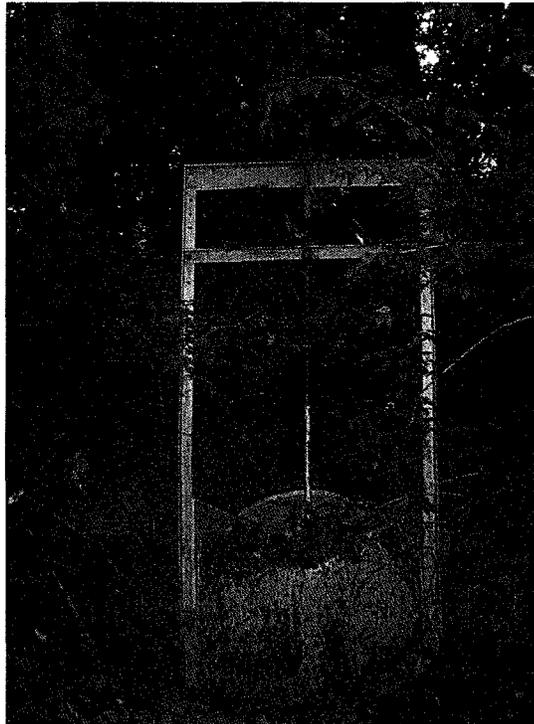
48" Sluice gate on landward side of levee (Station 0+50)
